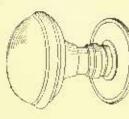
In this case the spindle is turned round at each end and threaded. The knob is provided with a swivel-nut, D, which fits the thread of the spindle. In applying, the nut is turned up until it bears slightly against the face of the
